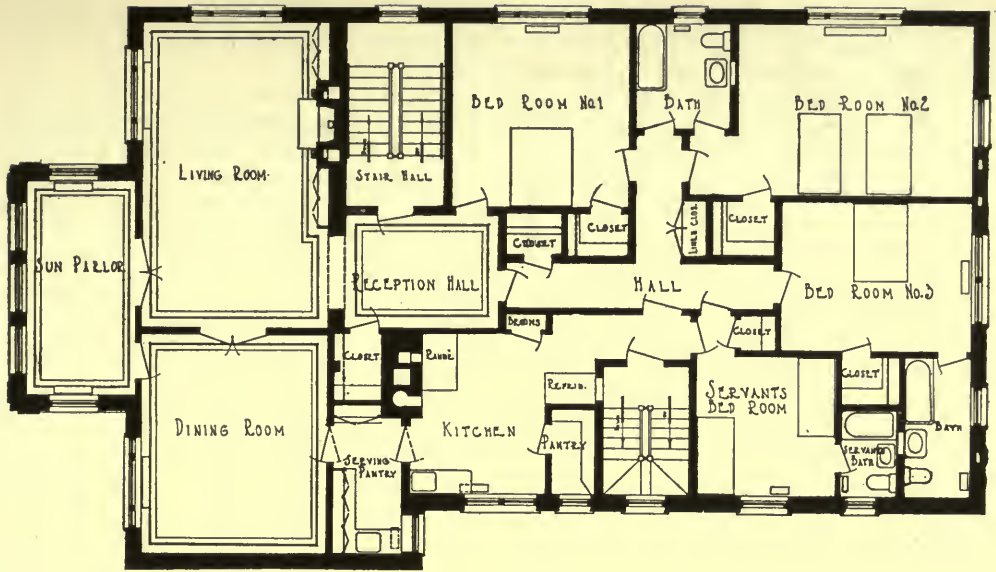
TYPICAL FLOOR PLAN OF APARTMENTS AT 21 AND .31 EAST ELM STREET, CHICAGO, ILL. W. D. MANN, ARCHITECT
